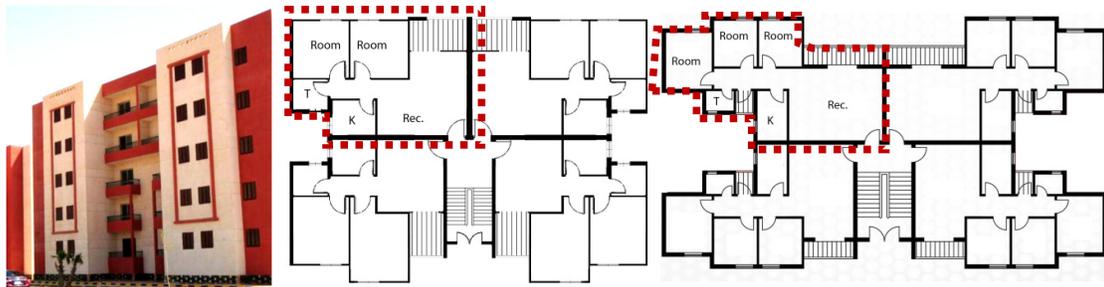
, Respectively NSHP elevation and 75& 90 m<sup>2</sup> unit's plan (author's drawings)
